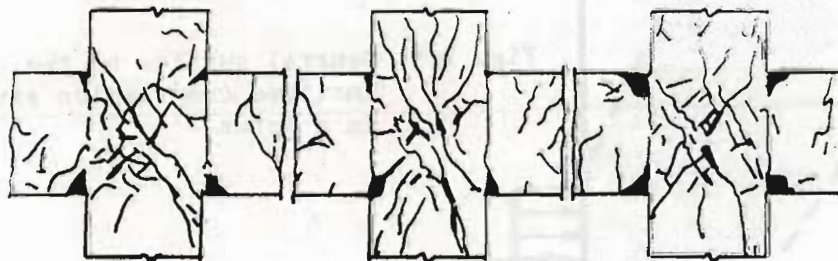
Compression failure of beam-column joints after formation of hinges under cyclic loading (Kamimura, et al, Japan)
